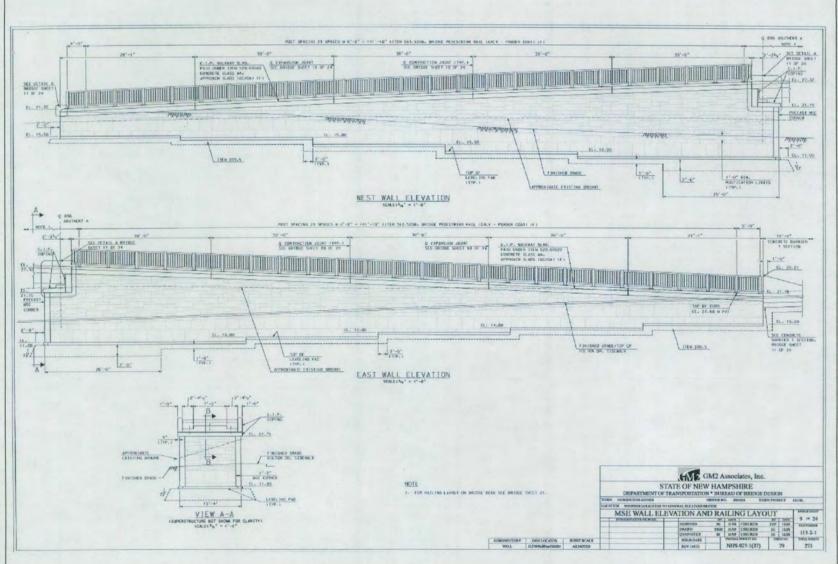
2009 plans for the new north bridge approach and abutment modification, MSE Wall Elevation and Railing Layout.
